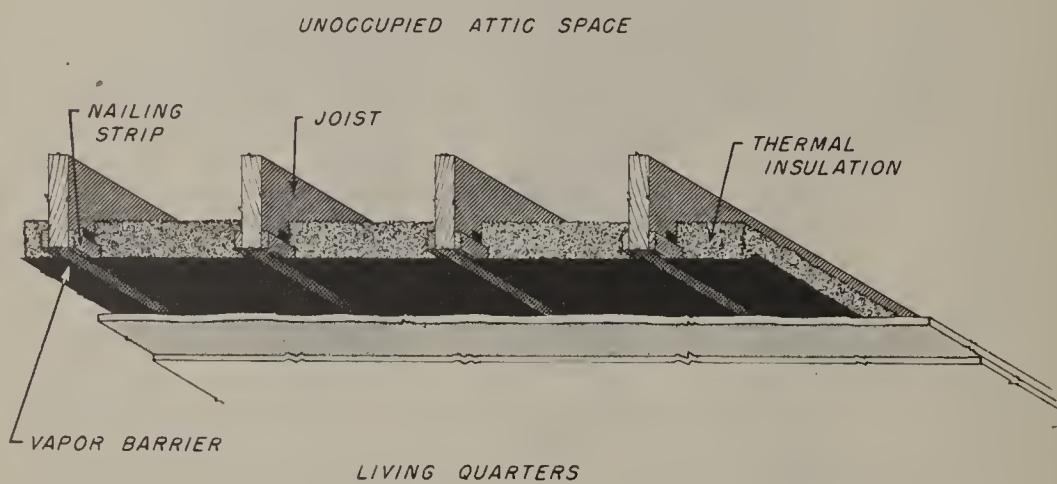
Ceiling construction adjacent to an attic space, installed in an existing building.* Condensation control is obtained in this detail by a separately applied vapor barrier installed in an existing building and held in place by wood strips laid over the turned-up edges of the barrier. The thermal insulation may be fill or batt type.
